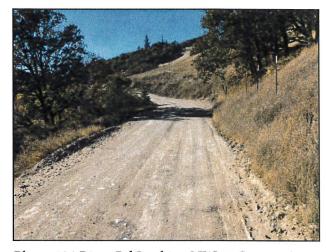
River Rd Looking NW @ Curve w/ Pullout
